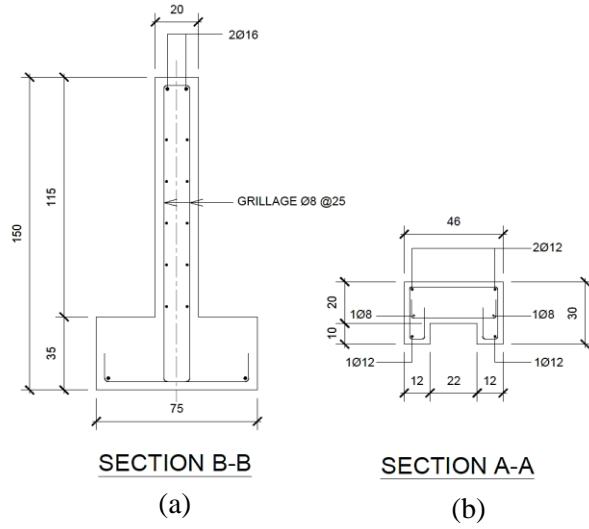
(a) Section B-B: Geometry and layout of the foundation system. (b) Section A-A: Geometry and layout of the secondary beam (units in cm).
